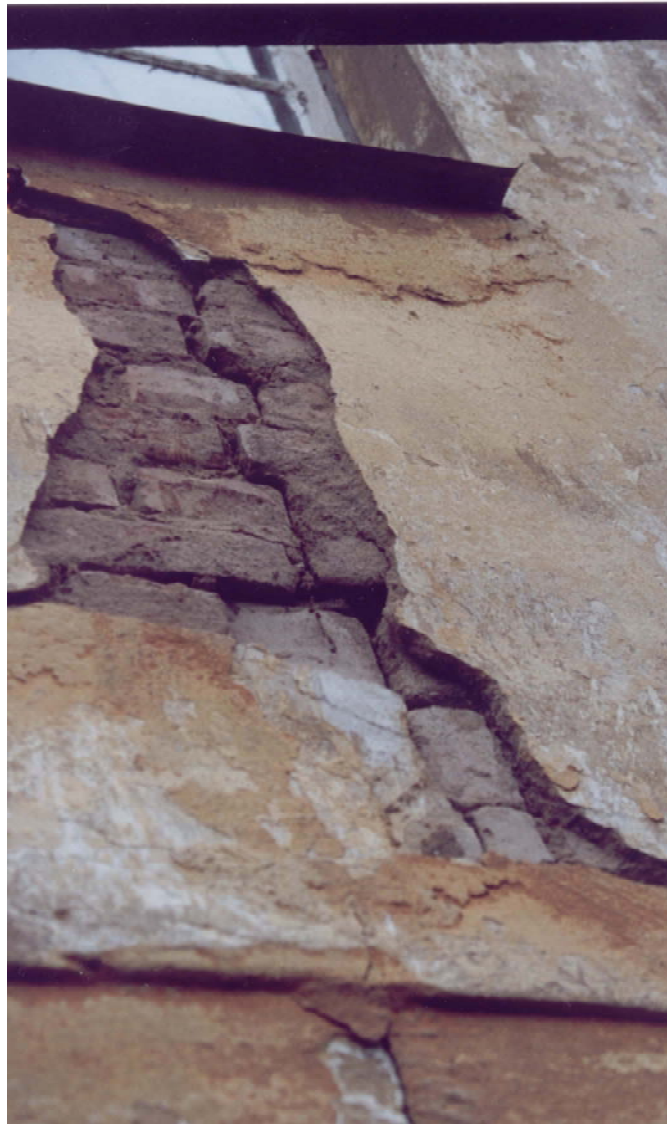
The wall cracks in the brick house of pre-war construction.
